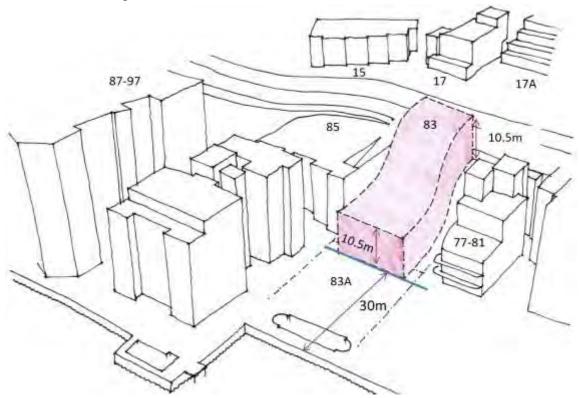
Indicative building envelope for an RFB under the existing Woollahra LEP 2014 planning controls
